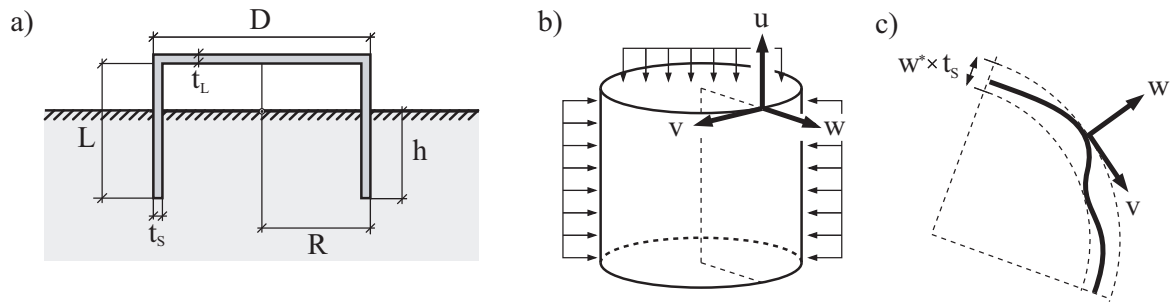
a) Definition of bucket dimensions. b) Applied load and cylindrical coordinates.
